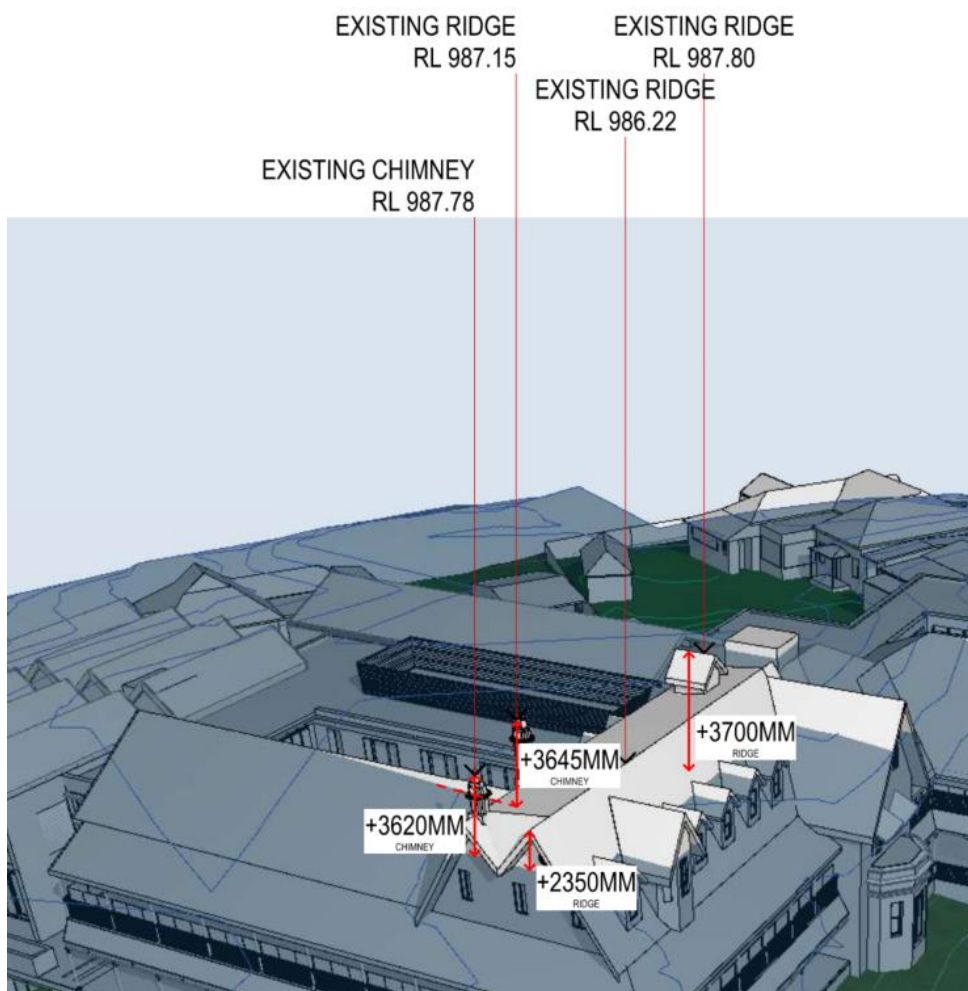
Existing variation on The Ritz building A1 roof (Source: PBD Architects)
